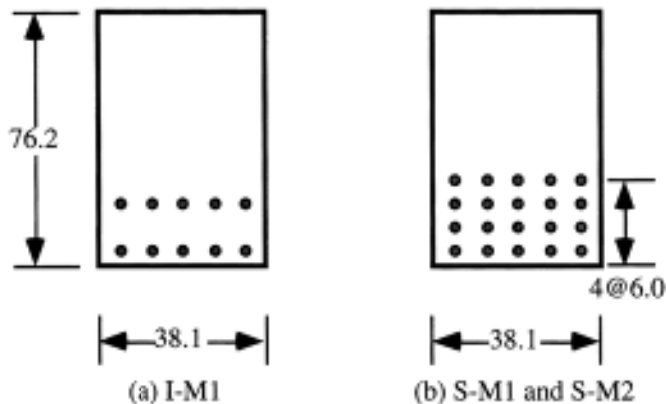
Cross-section of flexural specimen, showing position of glass fibers (units: mm)
